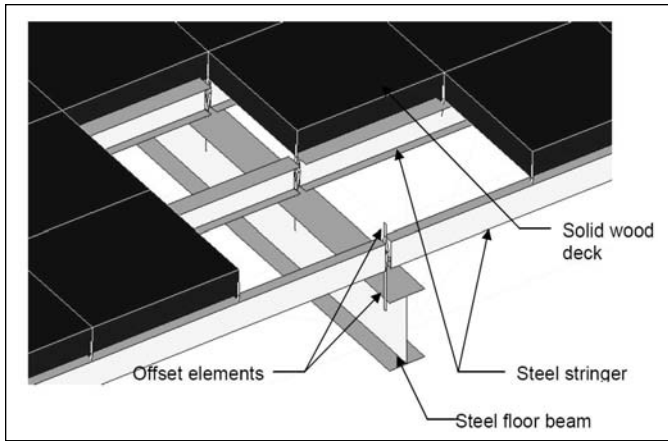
Computer-generated rendering of timber deck on steel stringers on steel floor beams. The deck has been modeled using plate elements interconnected at all their nodes (corners) and frame elements for the stringers and floor beams. The offsets are weightless “dummy” frame elements of high stiffness, used for connectivity only. This model is of the Blue River Bridge deck.
